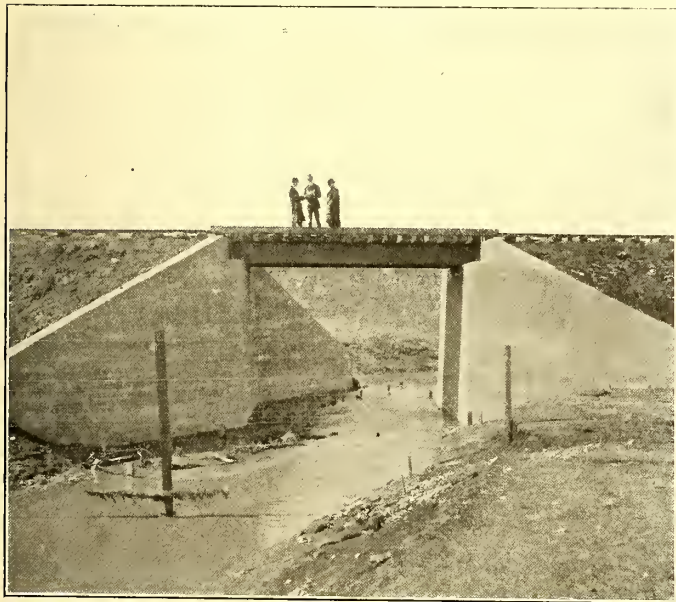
VIEW OF CONCRETE CULVERT ALONG THE LINE OF THE BLOOMINGTON, PONTIAC & JOLIET SINGLE-PHASE RAILWAY
